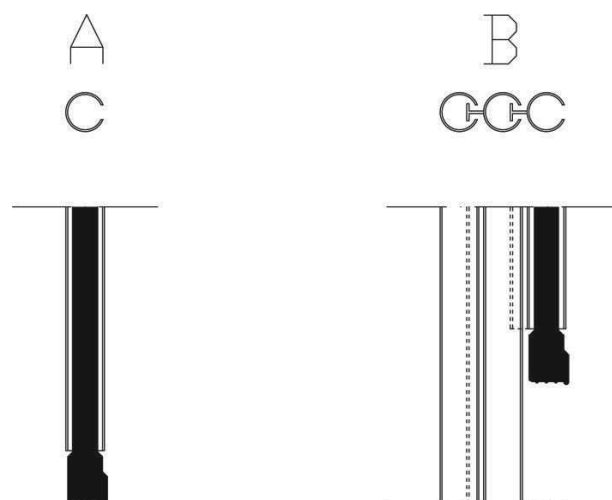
A drilled pile wall can be implemented starting with embedding of an open C section (phase A) and the wall can be extended using CT profiles.
